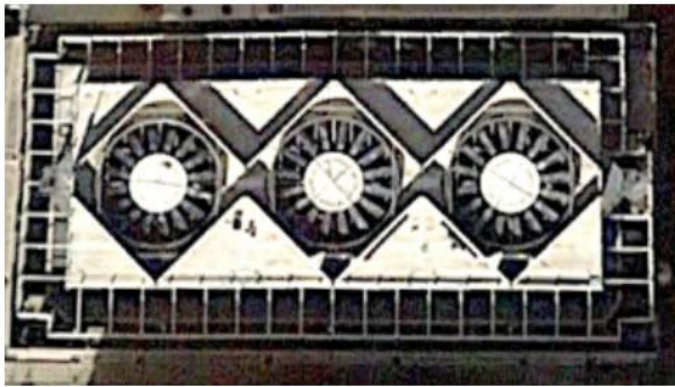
Aerial view of fan assembly installed inside the cooling tower.
